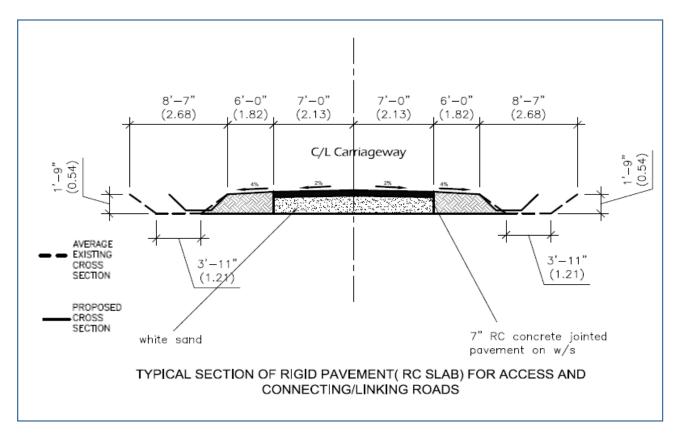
Typical Section of Rigid Pavement for Access and Connecting/Linking Roads¹
